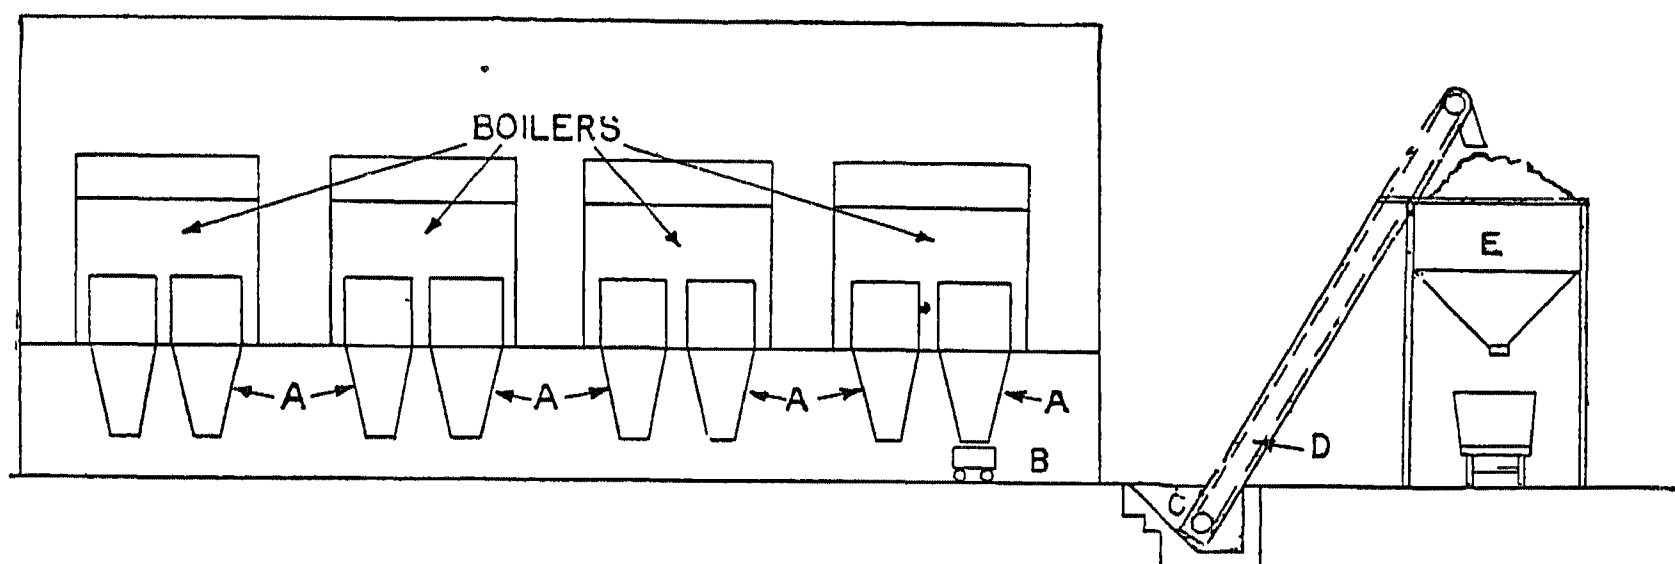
Typical Arrangement of Ash Handling Plant with Ash Wagons and Bucket Elevator
